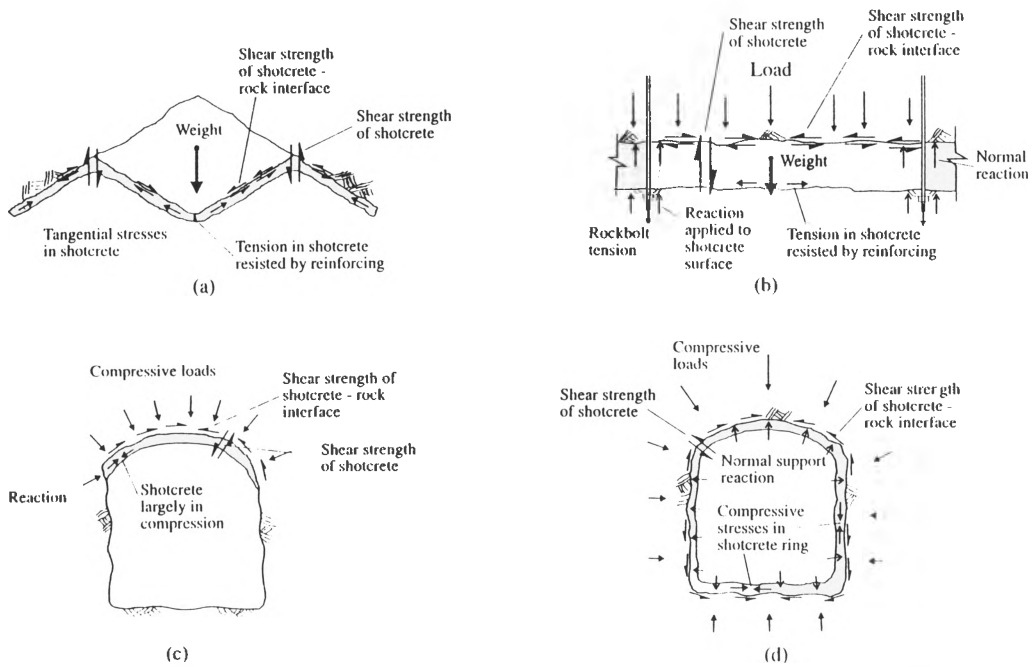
Some support mechanisms developed by shotcrete (a) single block, (b) beam anchored by bolts, (c) roof arch, (d) closed ring.
